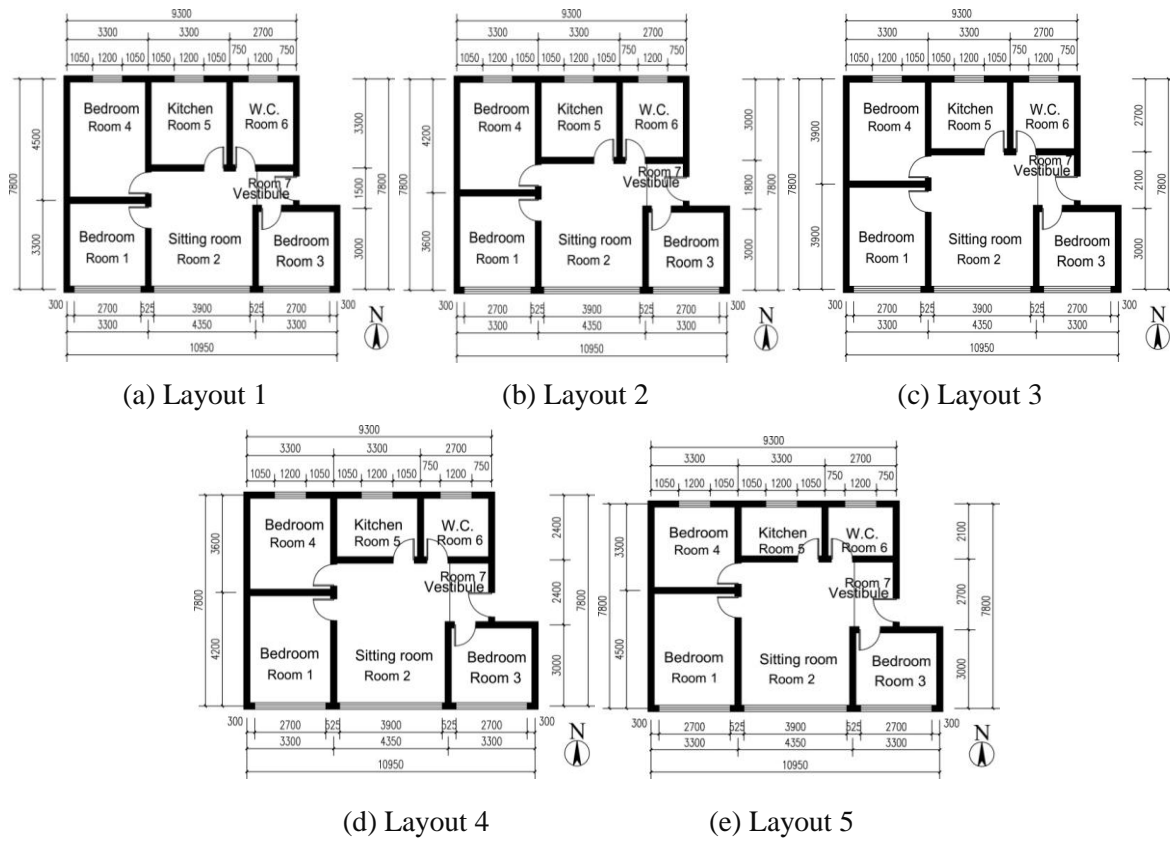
South and north room layout design models for direct solar gain unit (unit: mm)
